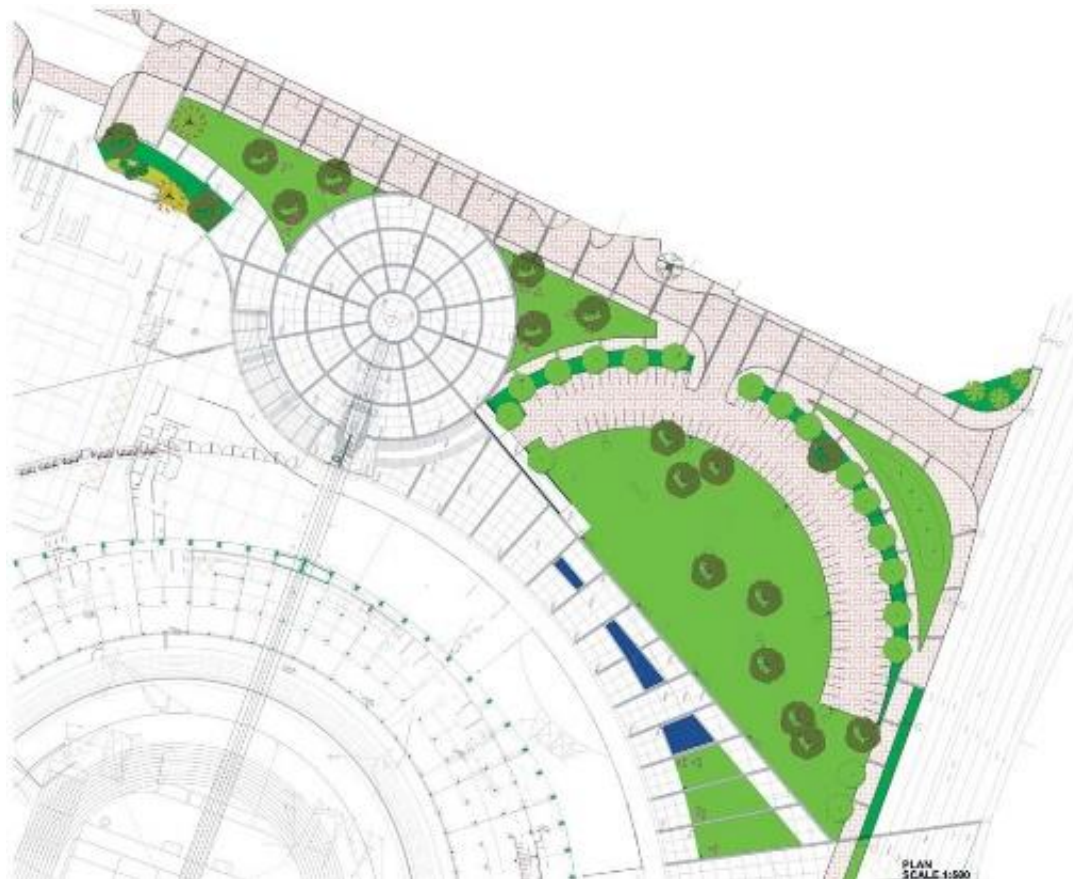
Plan of Imbizo Place, showing public parking area, landscaped area and water feature.
